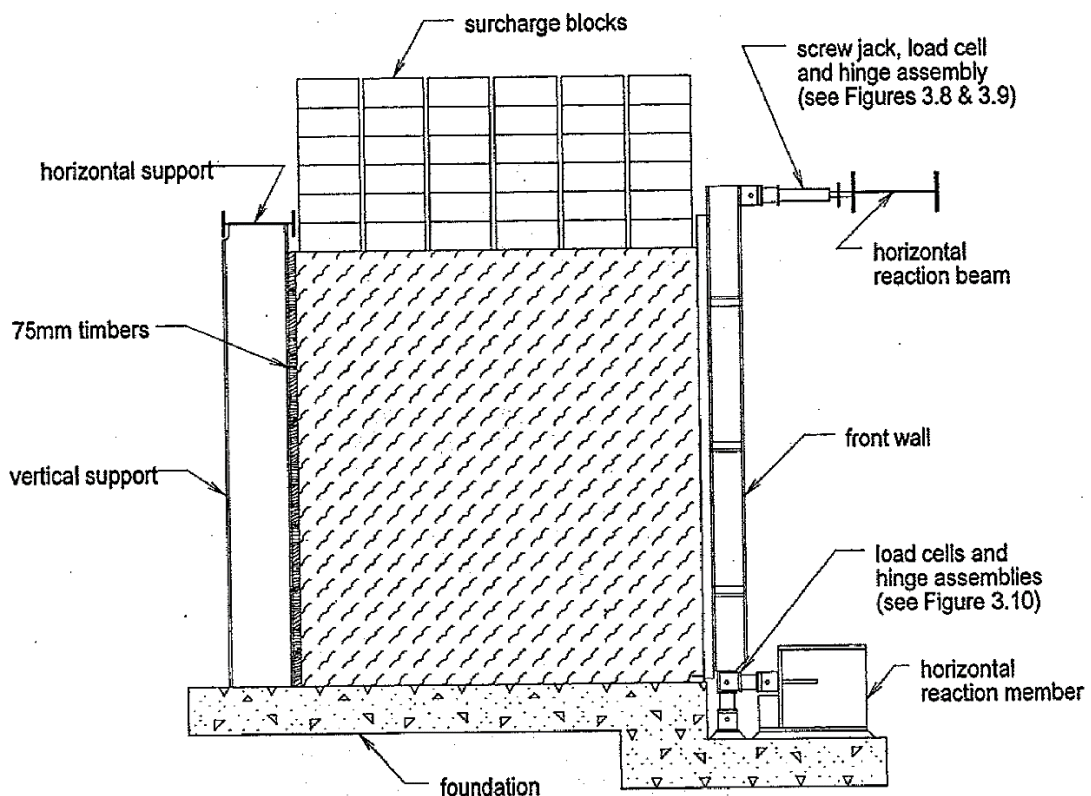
Cross section through University of Maine retaining wall test facility (after Tweedie, et al., 1998c)
